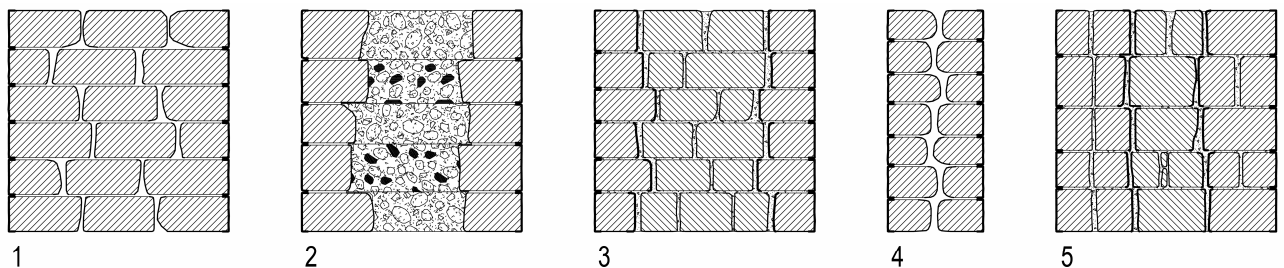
Schematic wall sections. Dura Europos, city wall (1), Halebiye-Zenobia, south and east sections of city wall (2), Halebiye-Zenobia, north section of city wall (3), Brad Church of Julianus (4, according to Tate 1992, p. 24, Fig. 21 and p. 88 Fig. 131), Resafa city wall, beyond the range of the wall-walk (5)
